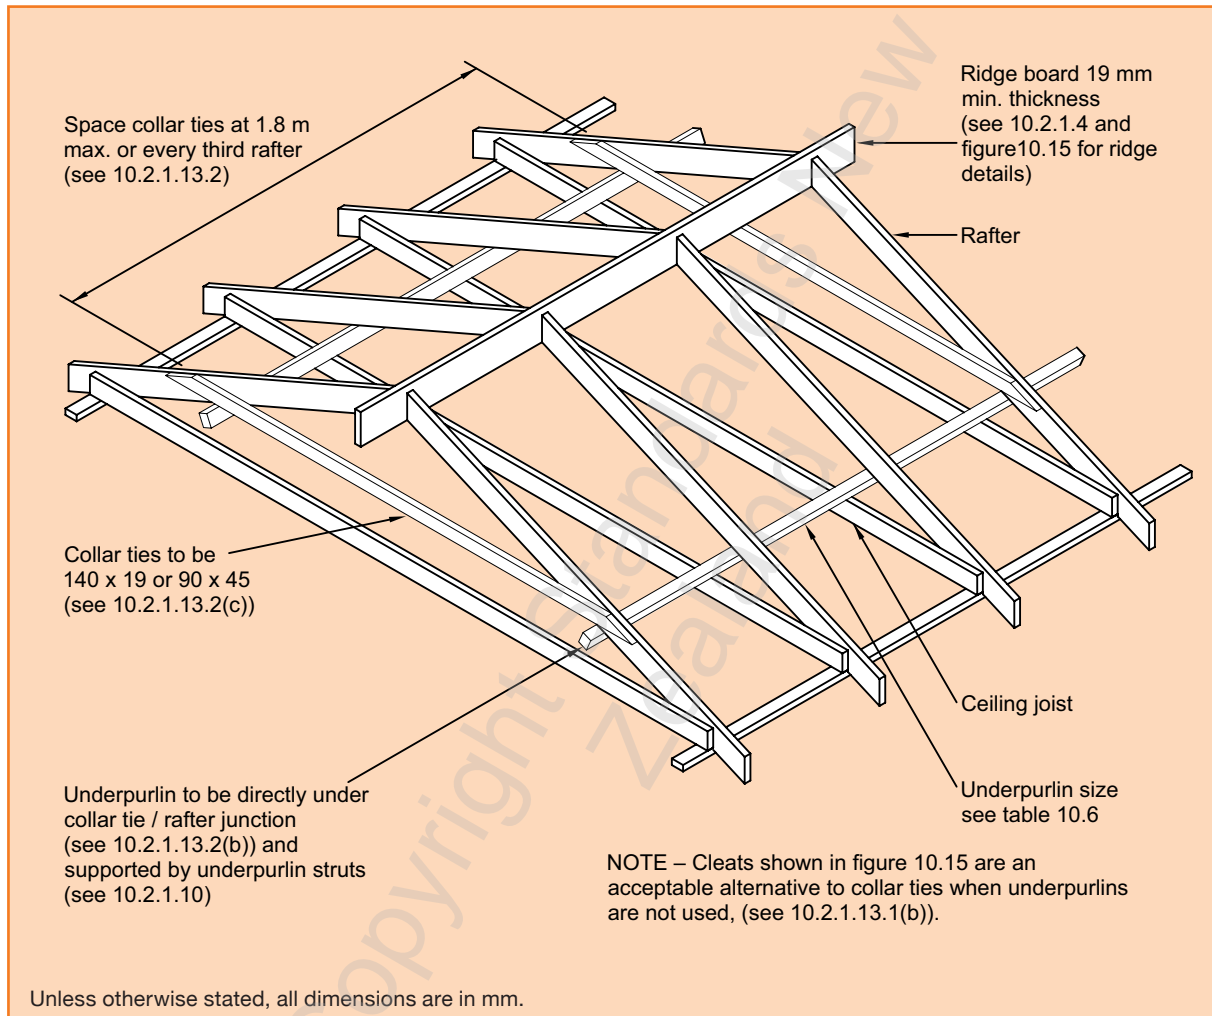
Collar ties and underpurlins – Roof pitches greater than 10° (see 10.2.1.13.1 and 10.2.1.13.2)
